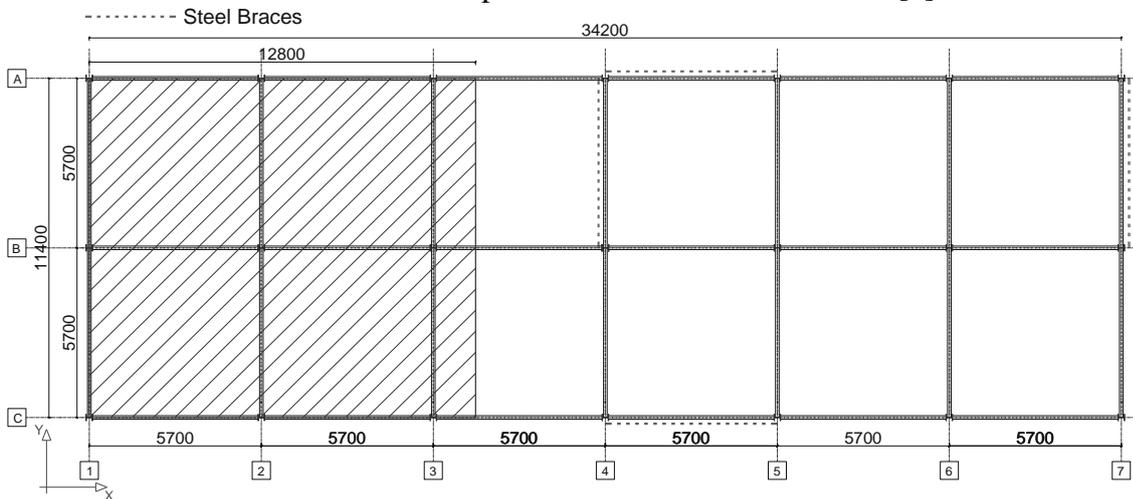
Floor Framing Plan - Symmetric Configuration (dimensions in mm)
